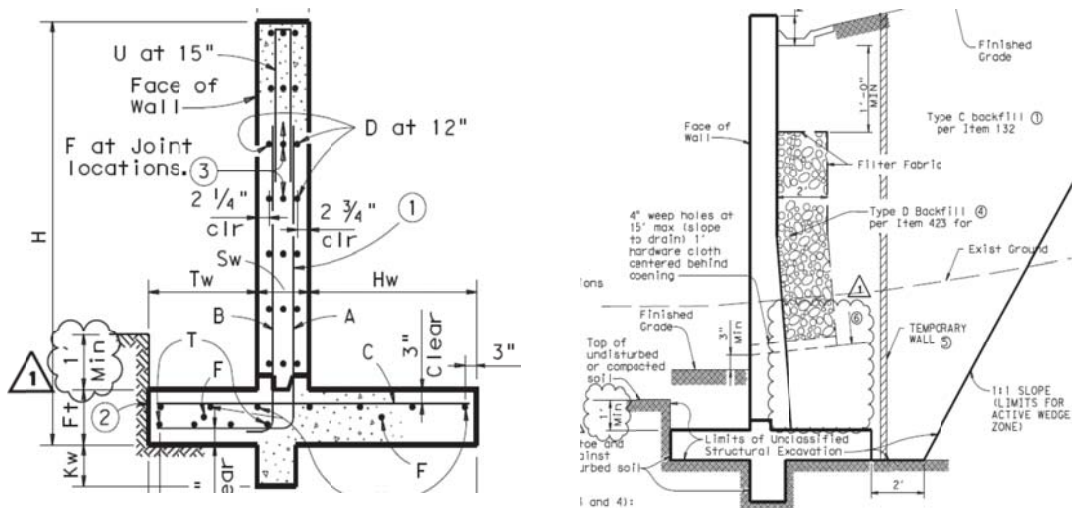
Typical sections and wall properties for Wall 1 (Personal archive 2012)
